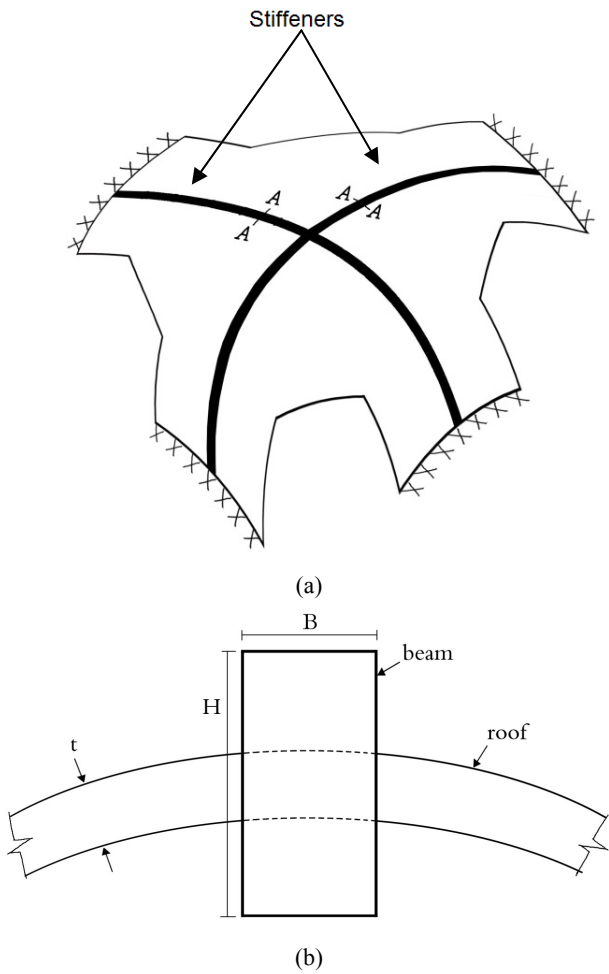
Polygon shaped spherical shell with stiffening beams: (a) the roof with stiffeners; (b) Section A-A.
